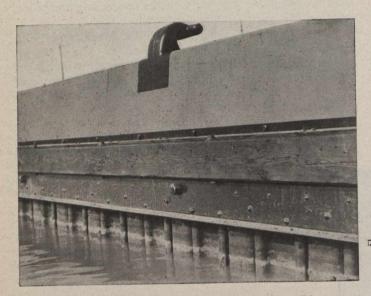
Piling Under North Wall of Don River Diversion, Toronto.
